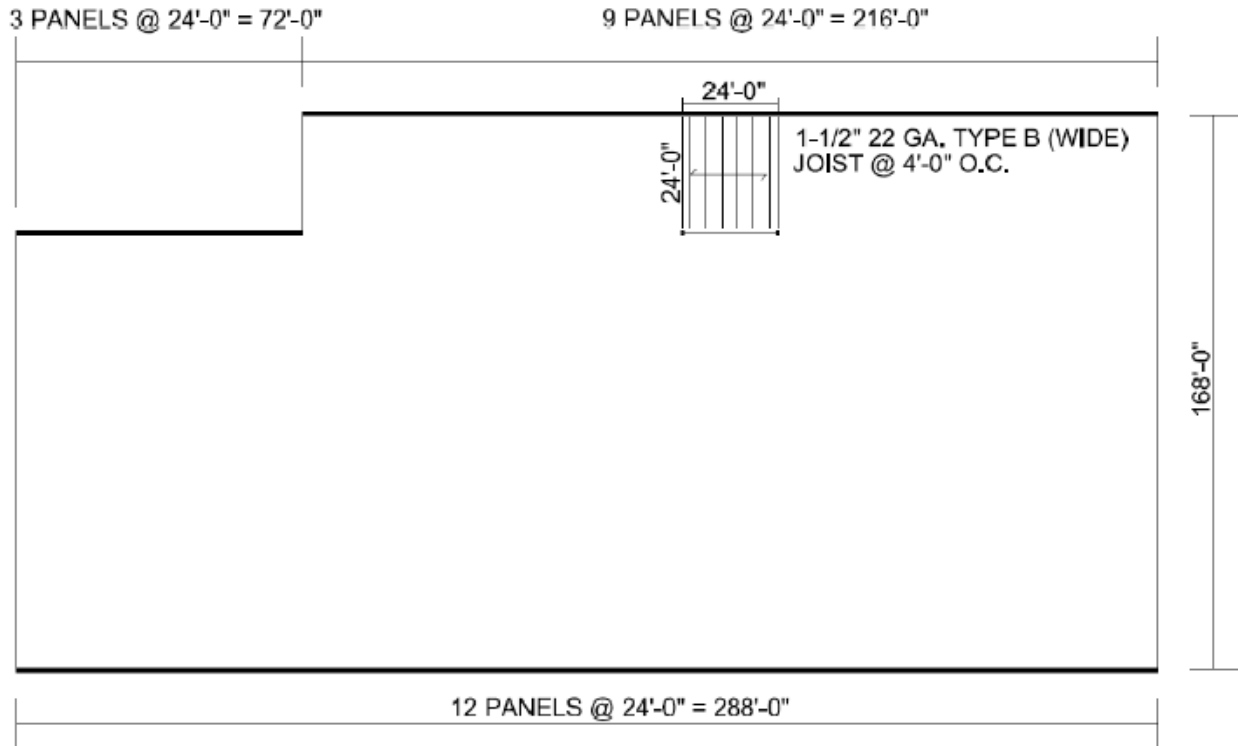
Case Study Floor Plan (Bartels 2010)
